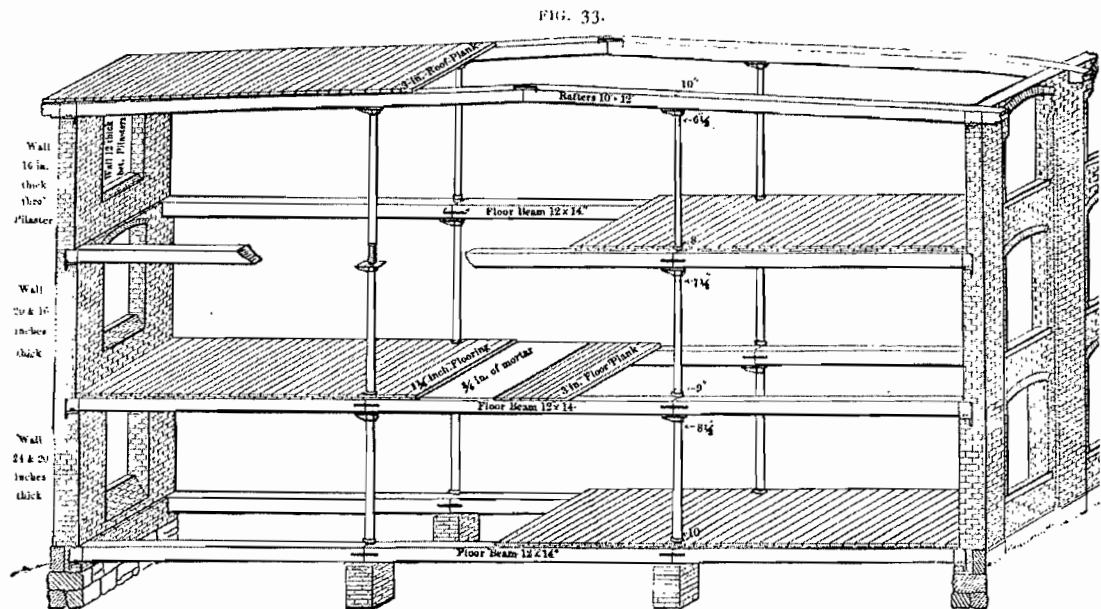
Slow Burn Plan. Heavy floor boards compensate for the loss of structural stability due to the removal of all joists. Also, brick pilasters allow for greater strength and larger window openings. The plan calls for the pilasters to be 24" & 20" thick at the first floor, 20" & 16" at the second, and 16" at the at the third. Originally published by mill engineer C.J.H Woodbury in 1882, reprint found in *The Works*, Bradley, page 128, figure 5.6
